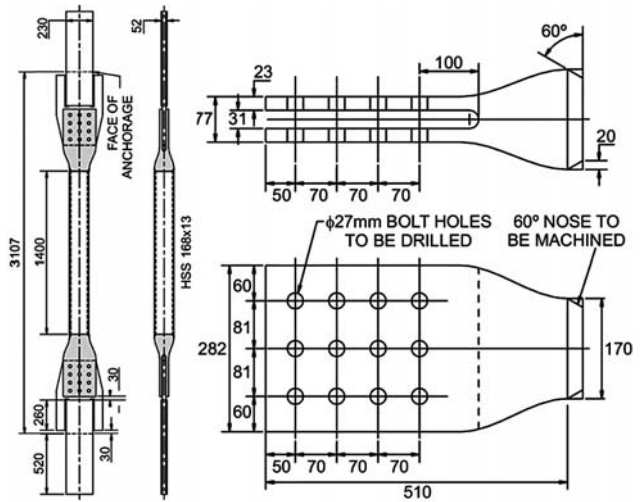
Standardized cast steel brace connector : (a) brace-connector assembly in frame ; (b) beveled nose detail that accommodates CJP welding to CHS of any wall thickness.
